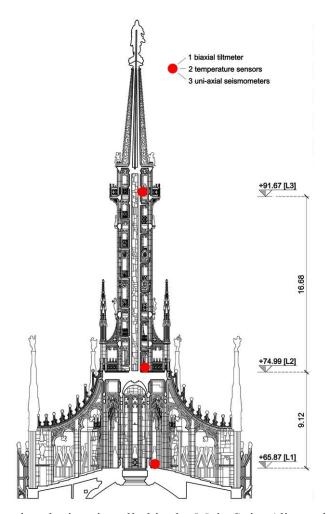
Sensing devices installed in the Main Spire (dimensions in m)
